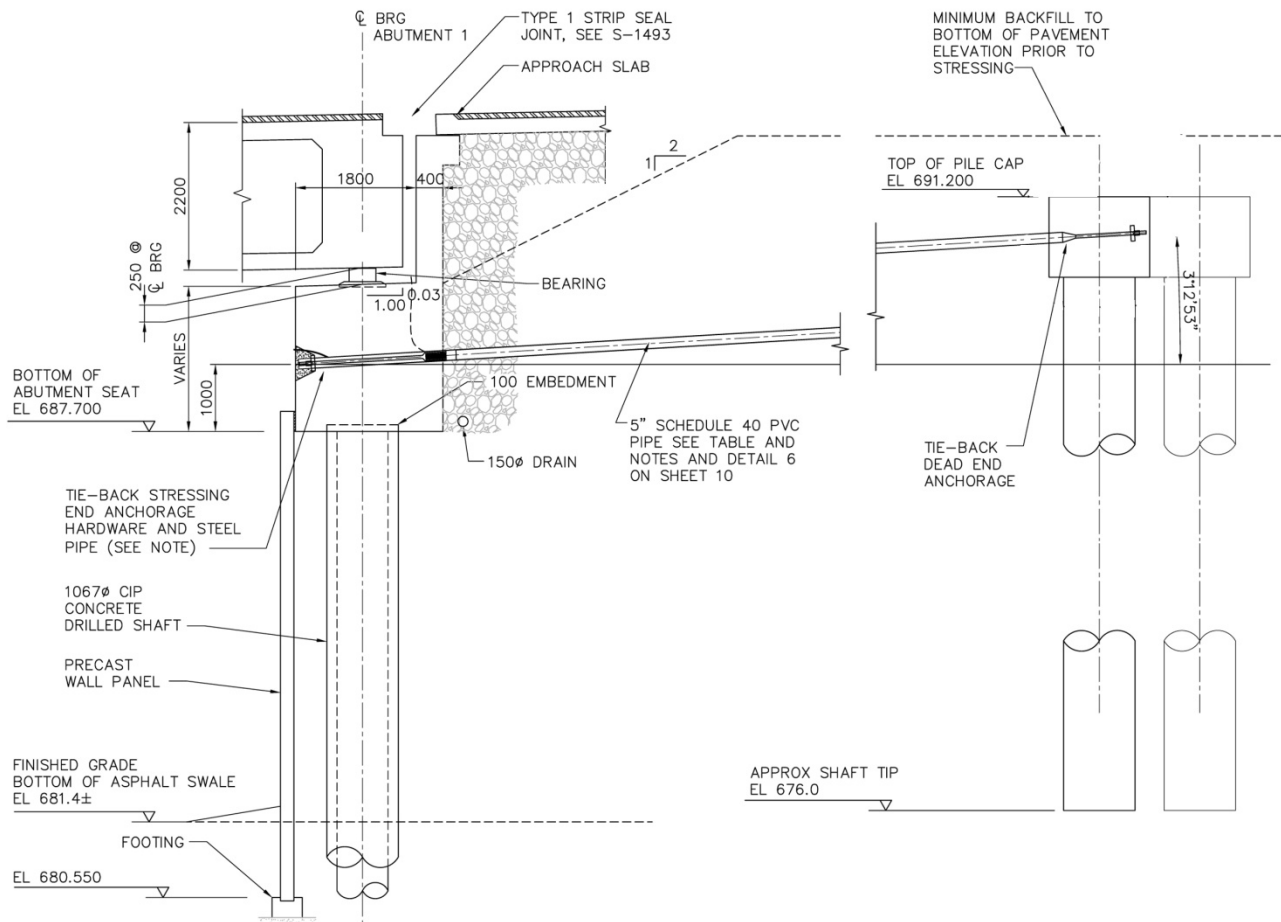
Tangent Pile Wall Tie-Backs in the Final Design
